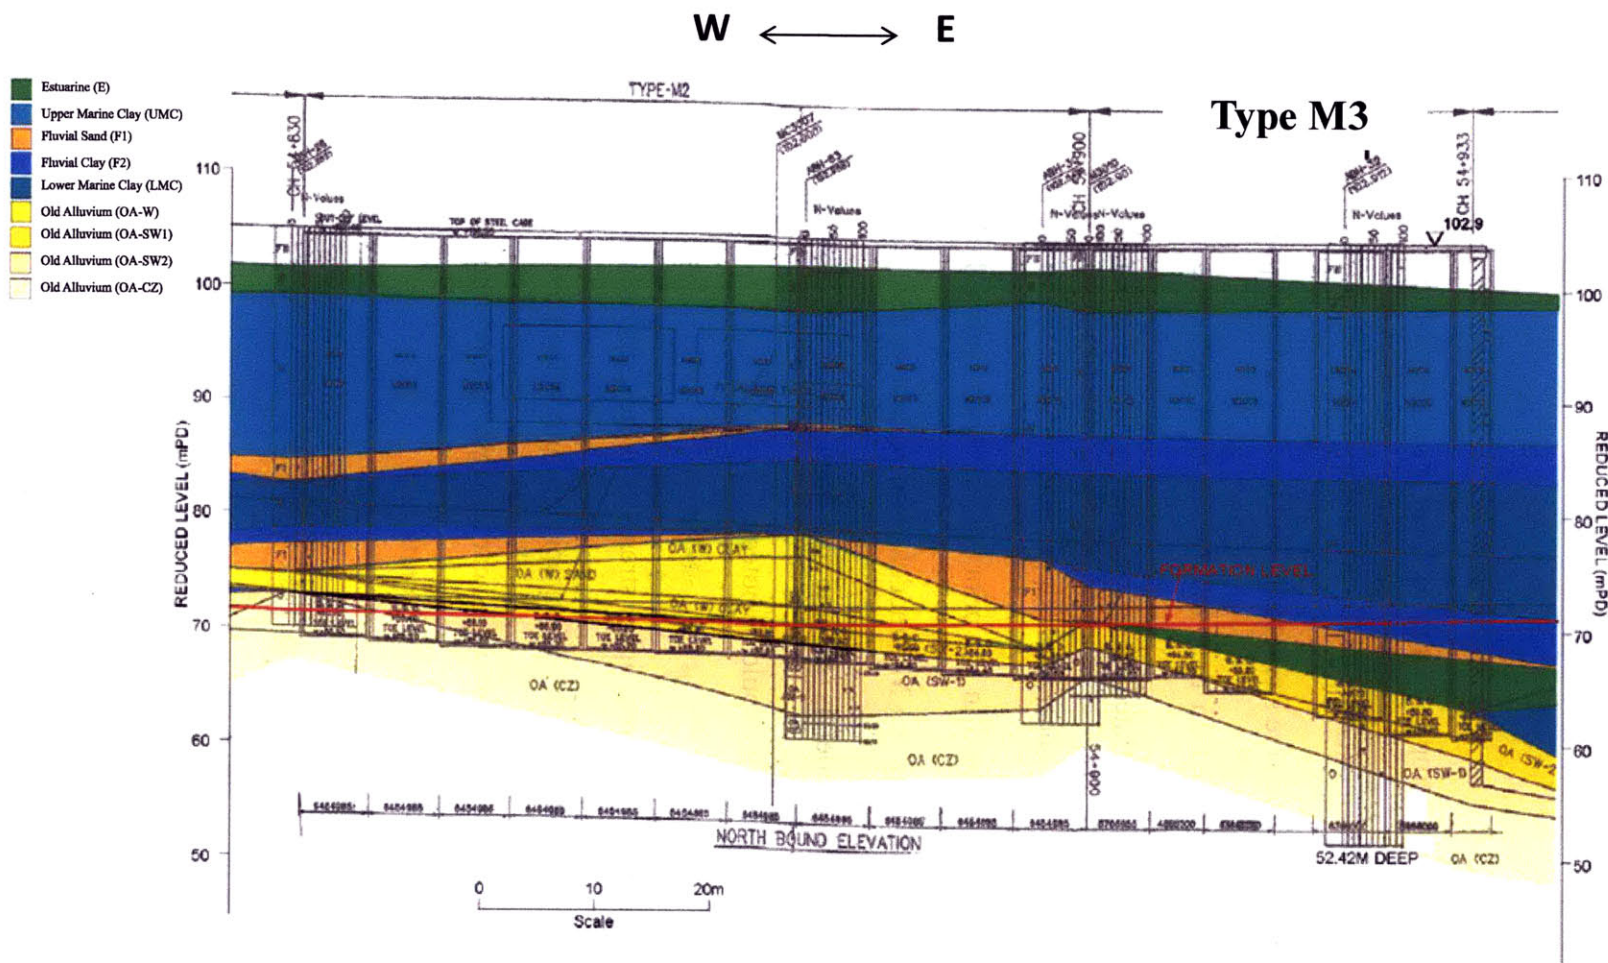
North Wall Section Stratigraphy at M3 area (COI, 2005).
